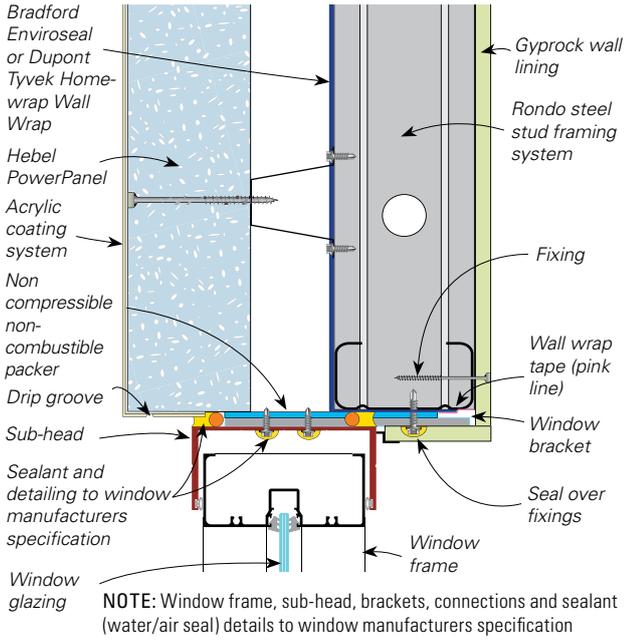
Full height window head with shelf angle (sliding door similar)
